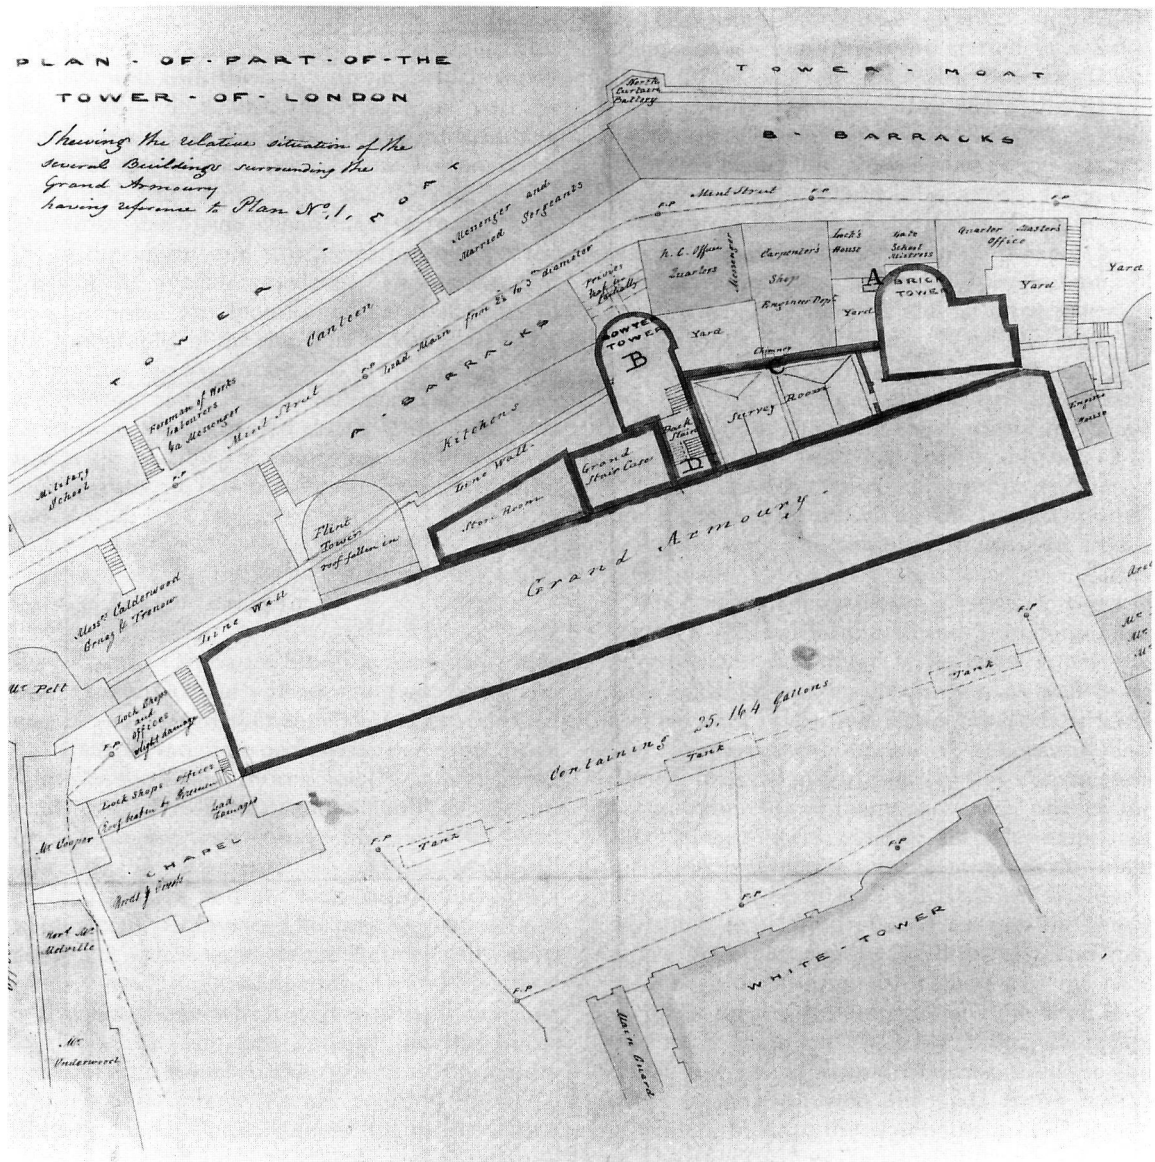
Tower of London: plan of part of the Tower of London drawn in 1841 with an assessment of the fire damage to buildings around the Grand Storehouse (the title Grand Armoury is probably a confusion of the main building with the Small Armoury which it contained); original in the Public Records Office, PRO MPH/892
